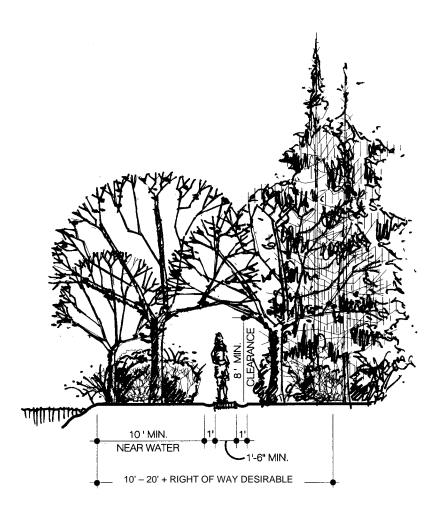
Section of Typical Semi-Primitive Trail (Class 4)
